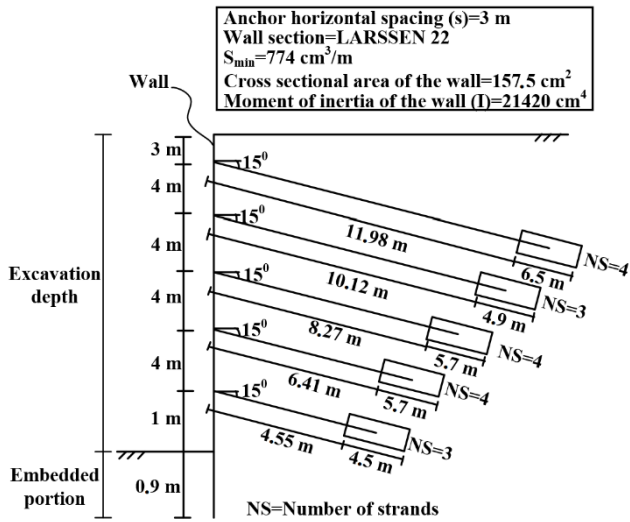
Wall geometry having the lowest cost for 15 m excavation depth
